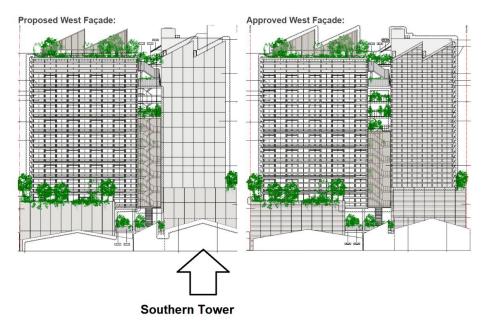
The western (rear elevation) Identifying differences between the southern tower approved and that currently proposed
